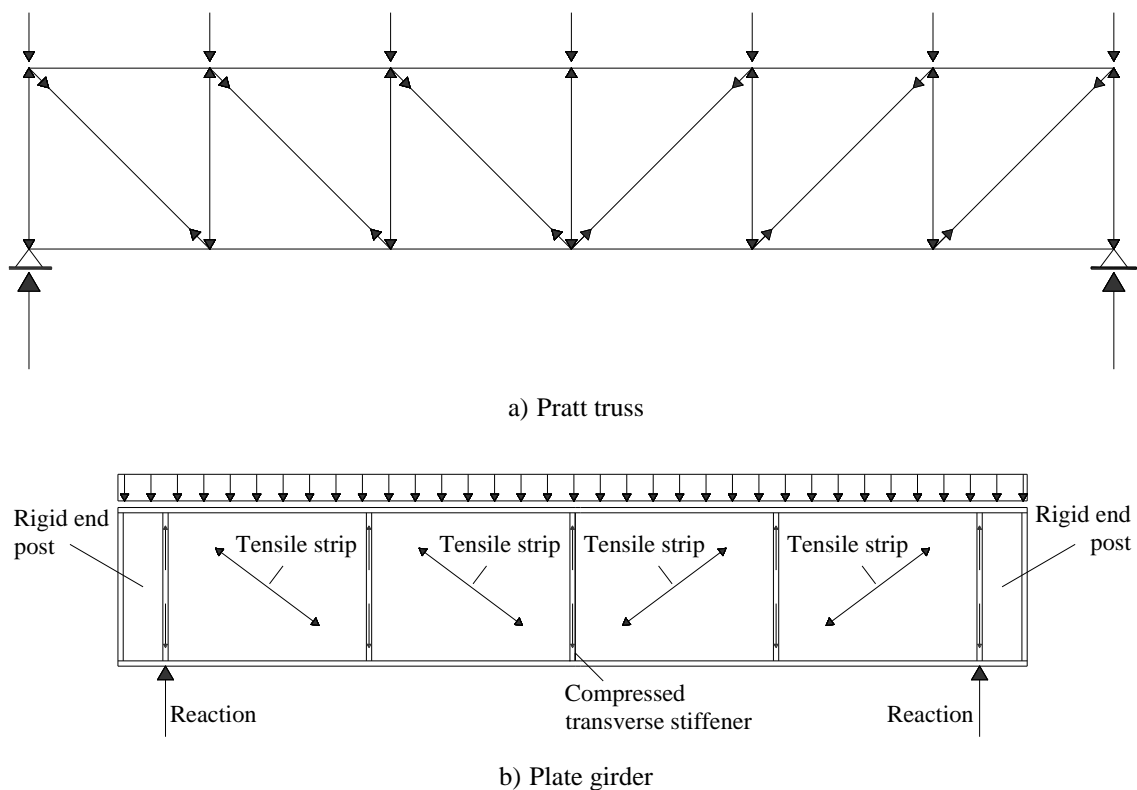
Analogy between Pratt truss and a plate girder subjected to shear buckling
